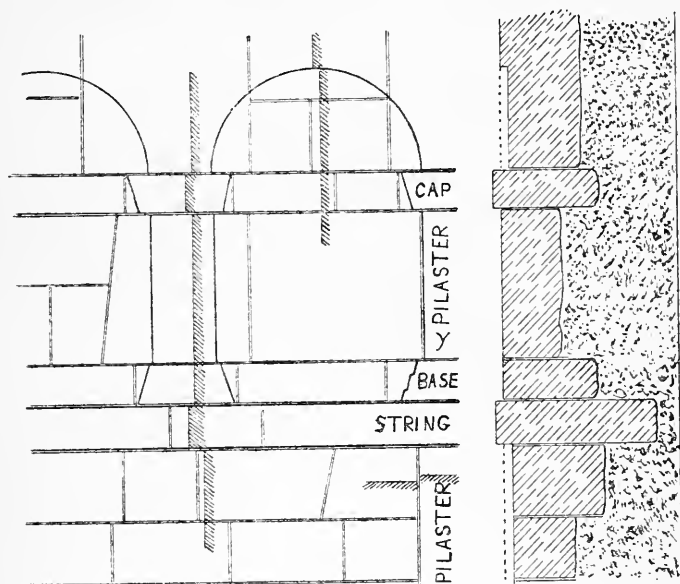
Pilasters, arcading, etc., on the exterior of Bradford-on-Avon, with section of chancel wall. Scale $\frac{1}{32}$ of nature. The original wall face is represented by the face of the upper and lower pilasters and the part above the arcading.
